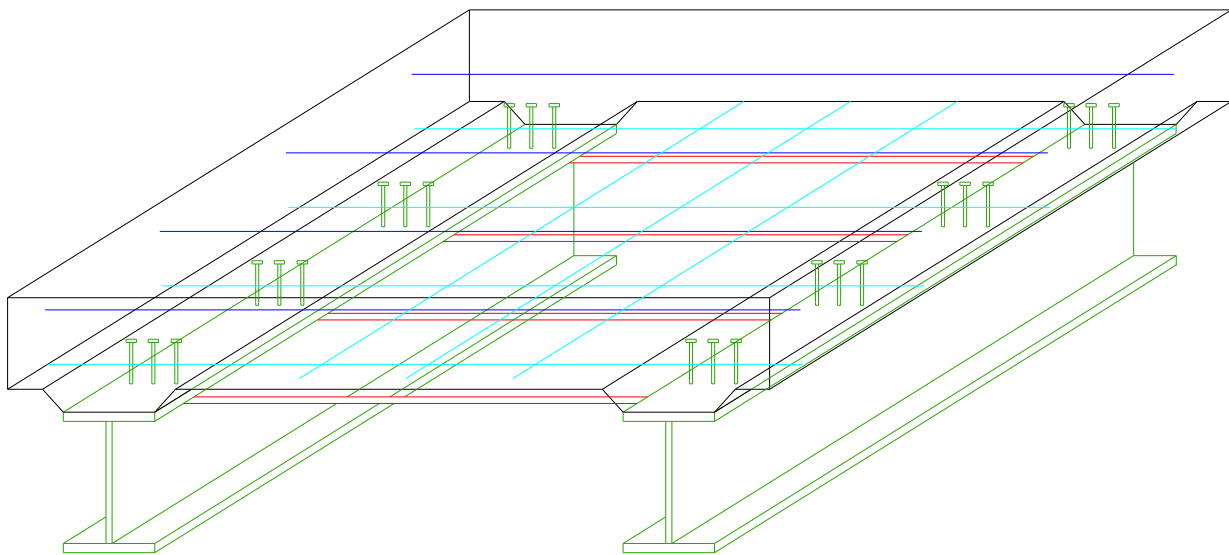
Typical bridge deck slab using second generation steel-free design method. Red signifies bottom transverse steel straps, dark blue signifies top GFRP crack control reinforcement, and light blue signifies bottom GFRP crack control reinforcement
